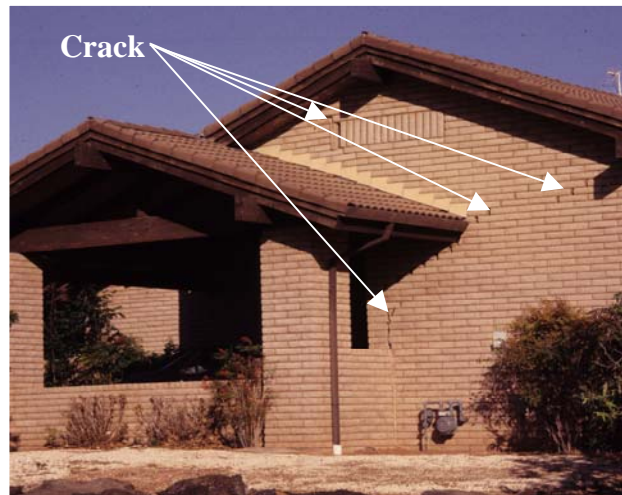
Damage to a house from expansive soil and rock in Santa Clara, west of St. George.
